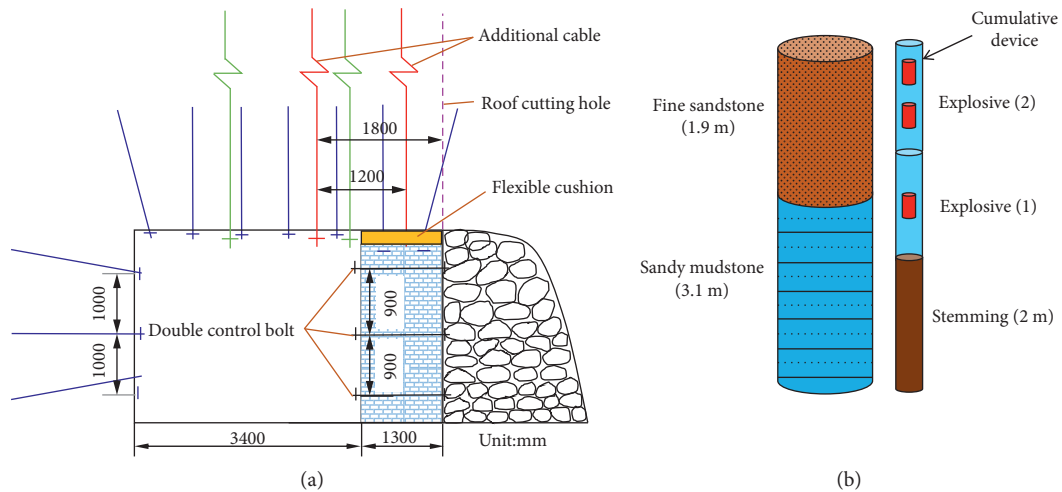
The new control scheme for floor heave and charge structure. (a) The control scheme for floor heave; (b) charge structure.
